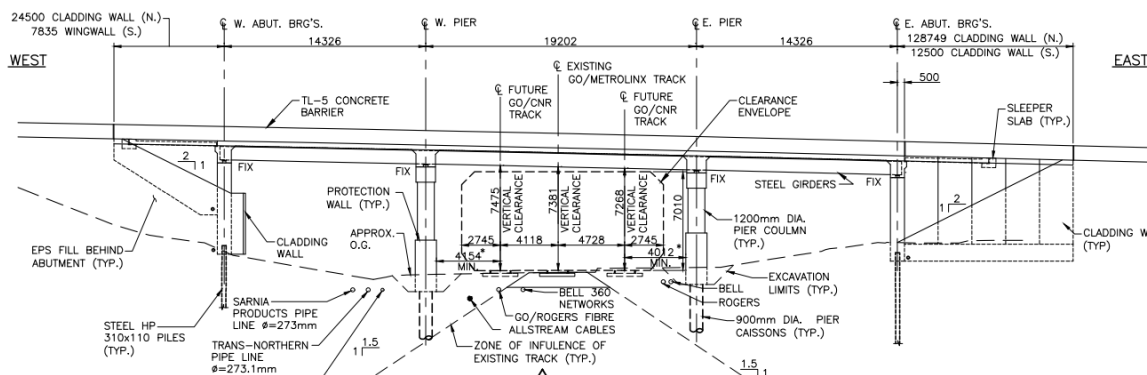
Hwy 401 eastbound collector Metrolinx Overhead bridge, with lightweight EPS embankments behind 8 m tall integral abutment walls, with a skew of 26°
